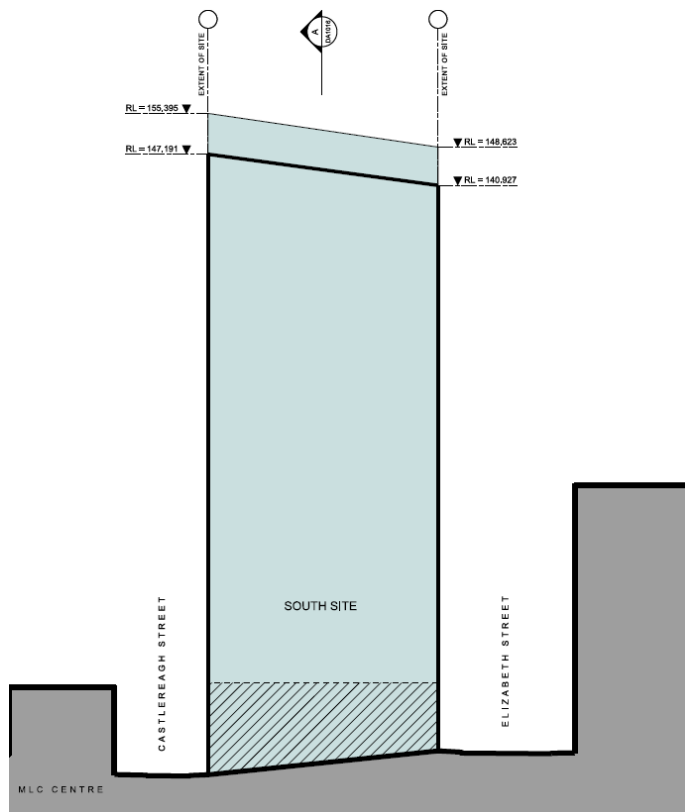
Proposed South OSD tower building envelope, east elevation
